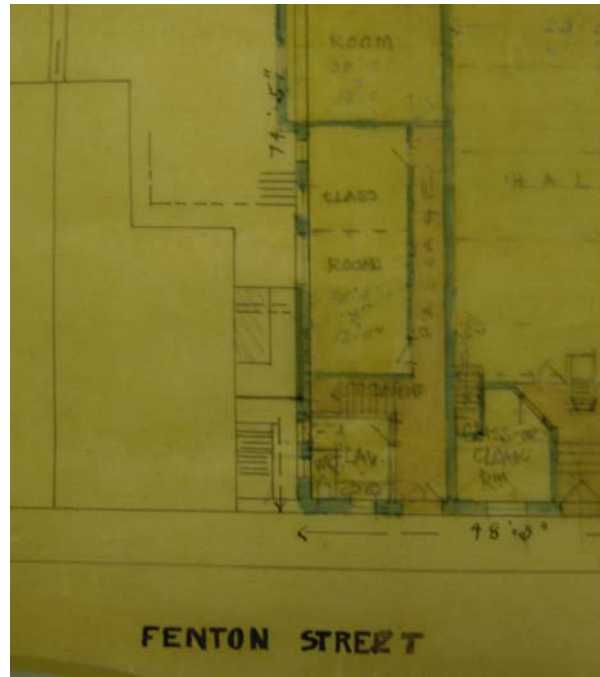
(right) Plan of the proposed Friends' Hall showing No. 4 (LRO FRL 2/1/29/8 1902-1909)
